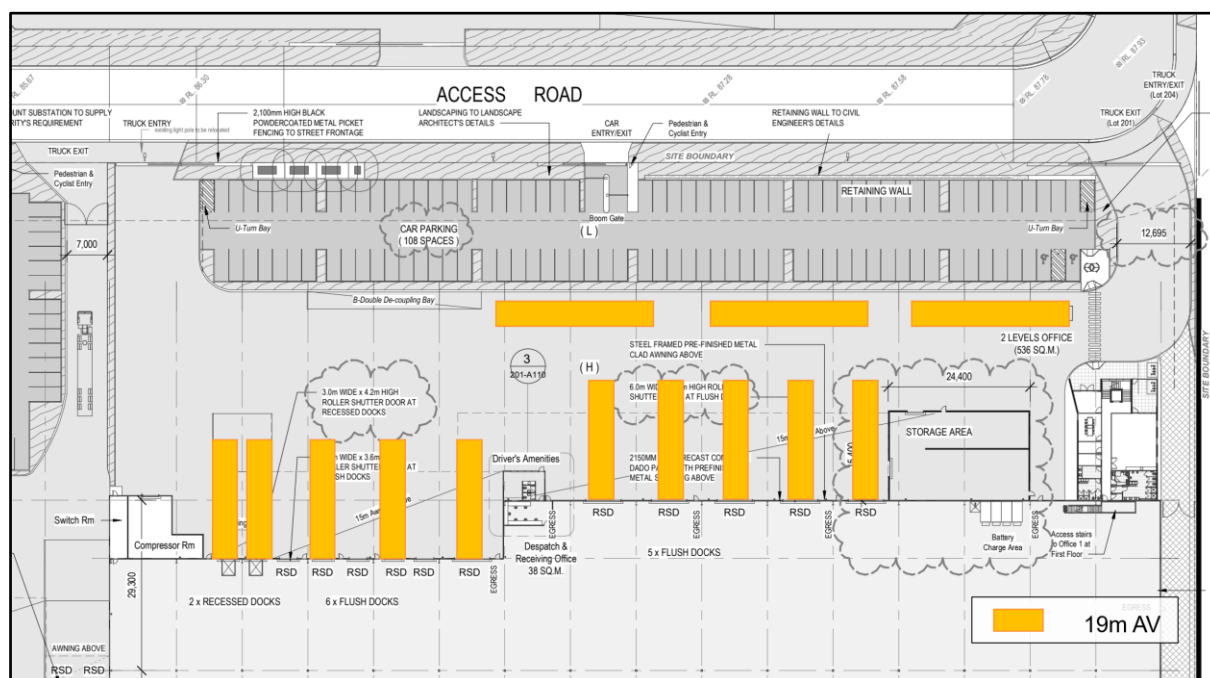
Warehouse 1 Loading Plan (19m AV's)
